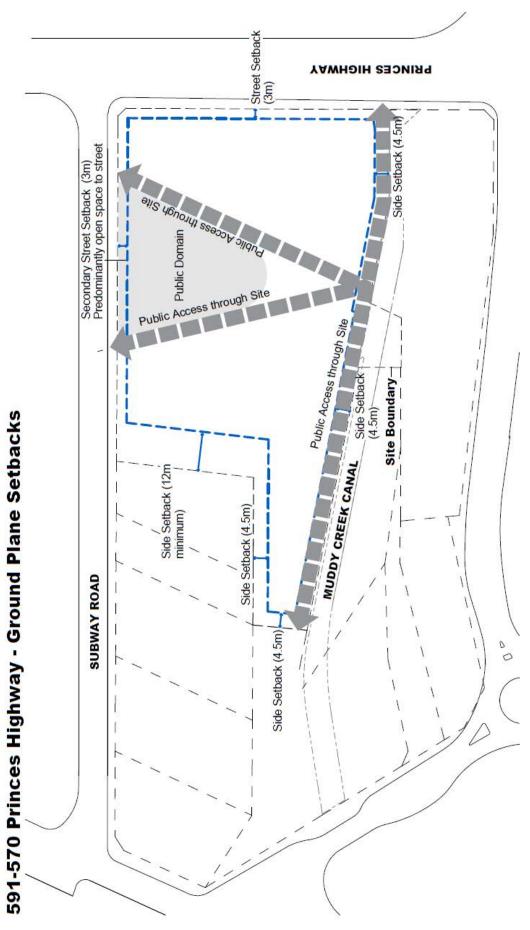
Area F - 591-570 Princes Highway - Ground Plane Setbacks
